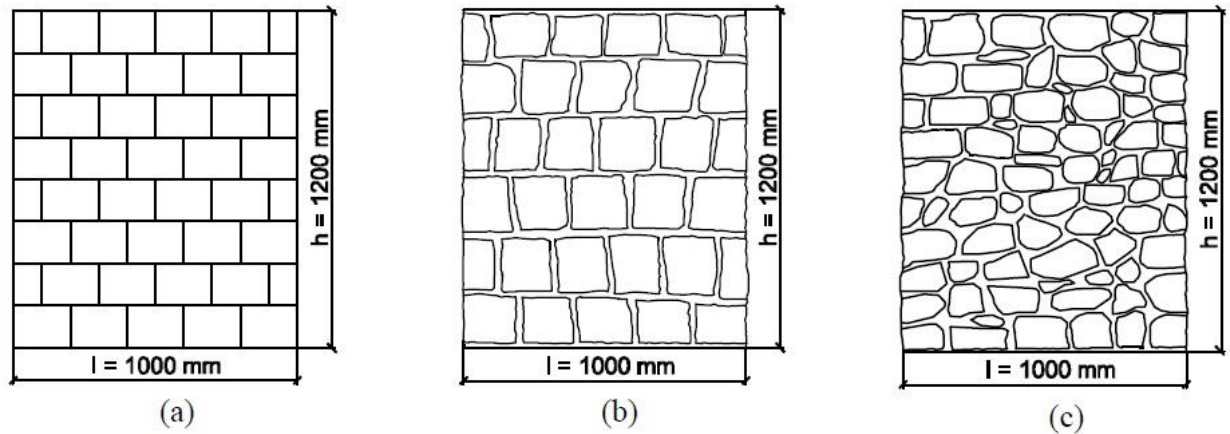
Masonry wall specimens tested by Vasconcelos: (a) Regular masonry with dry joints; (b) Hand cut stone masonry with linear joints; and (c) Rubble masonry [5]
